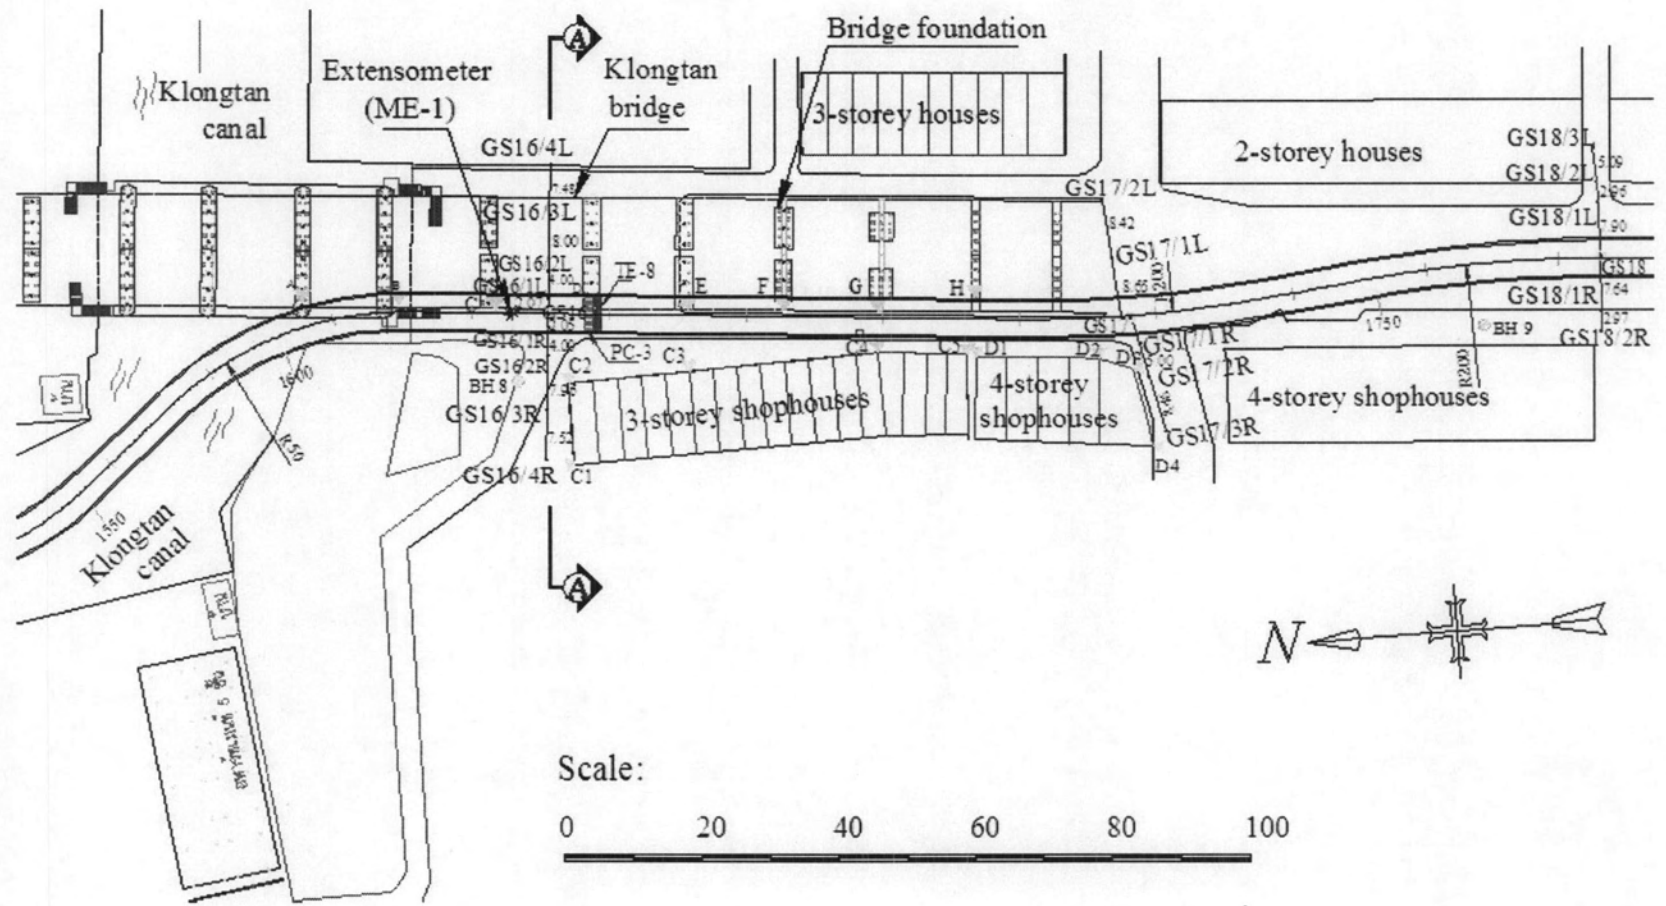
Klongtan bridge area (BMA flood diversion tunnel project)
